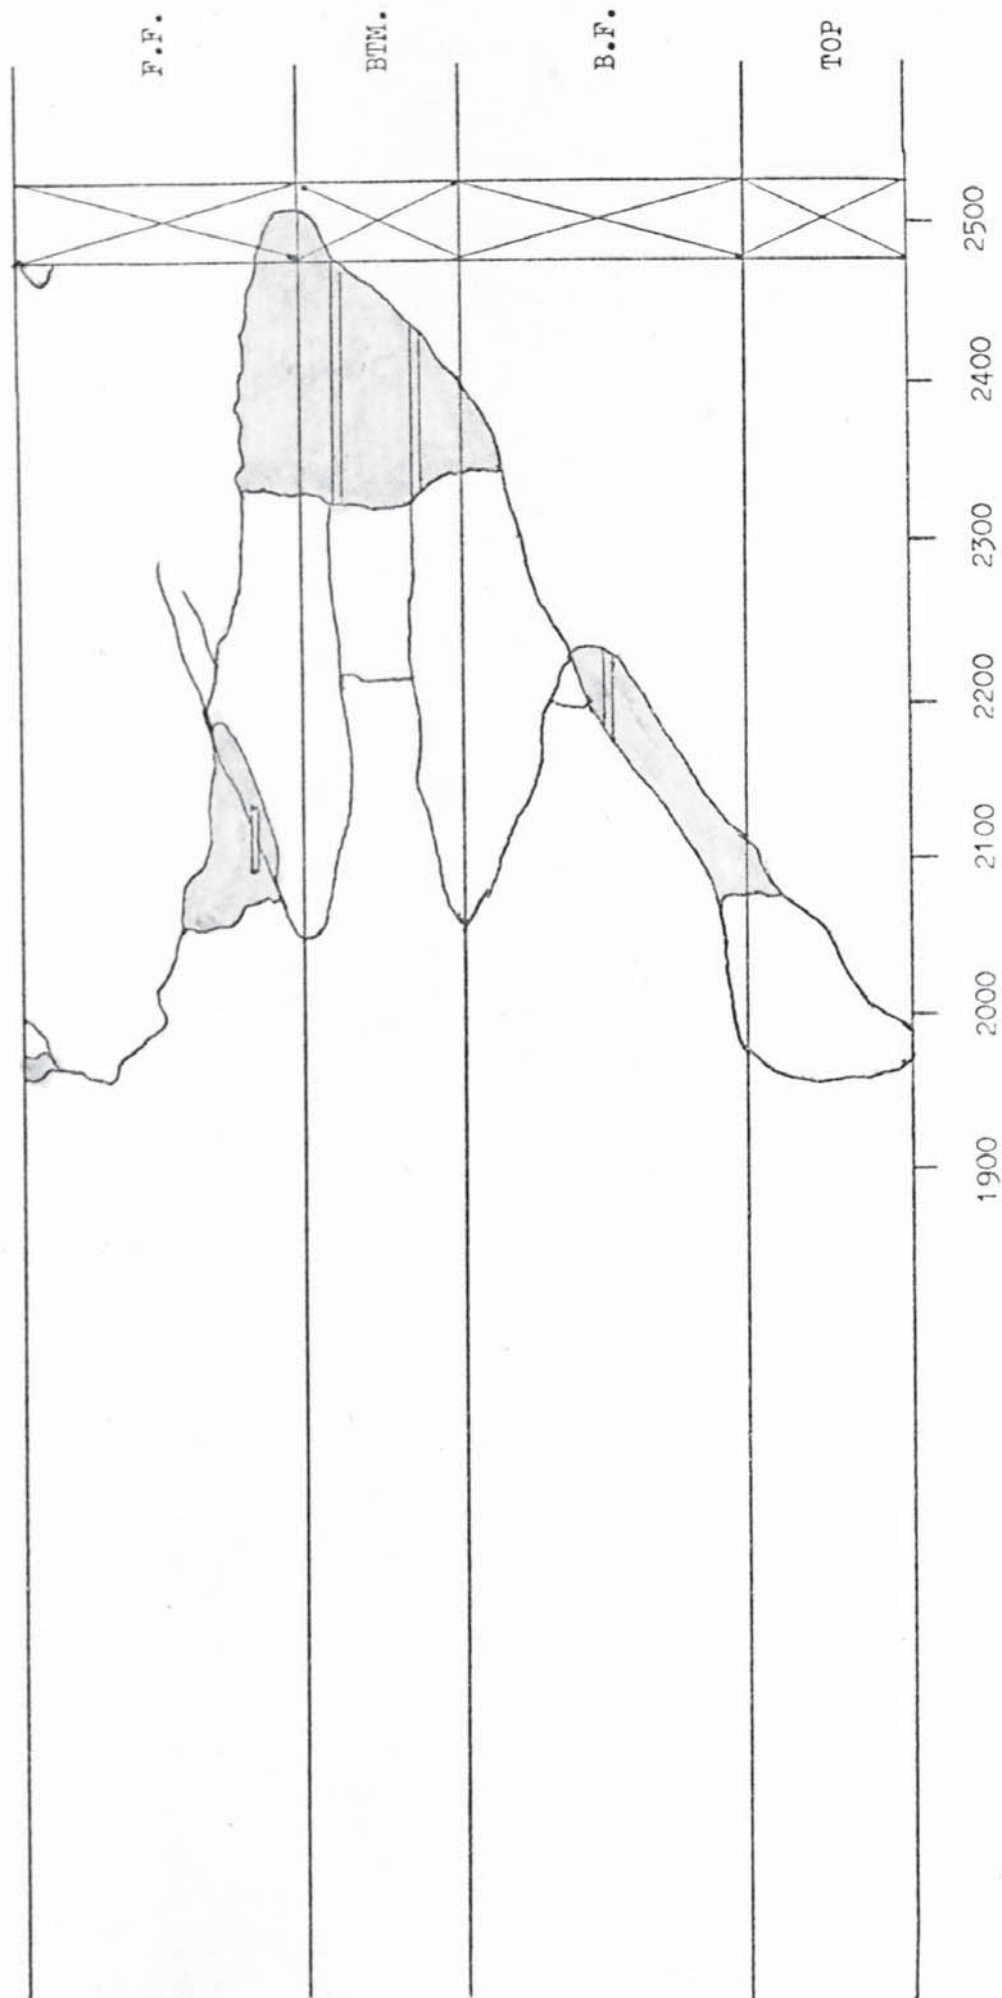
FAILURE CRACK PATTERNS - BEAM 23 ( MODE 2 )
